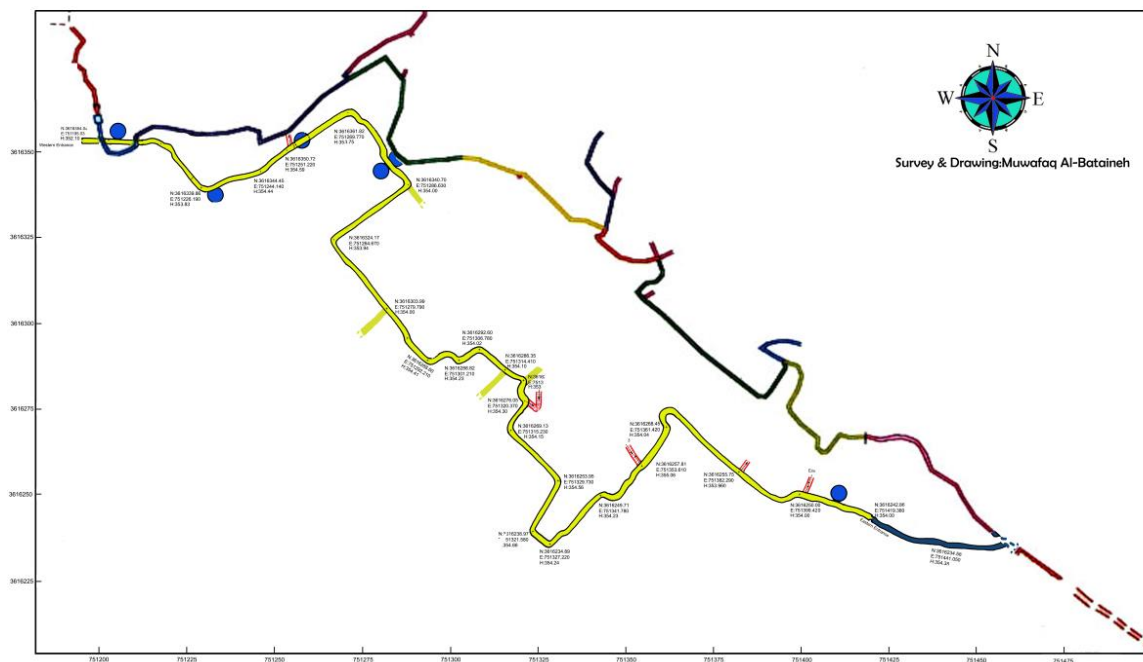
The lower and upper tunnel plans at the site of Umm Qais (Shiyab, 2019).
